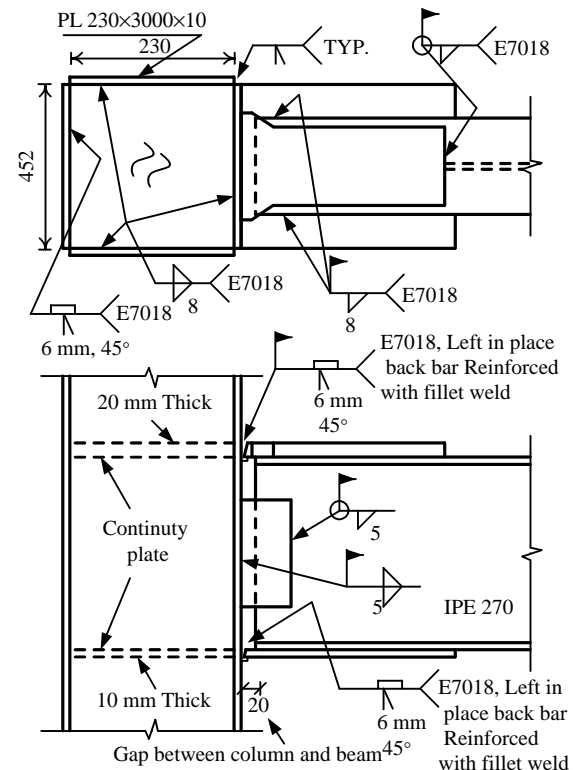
Connection details of specimen RC4, Ghobadi et al. [12].
